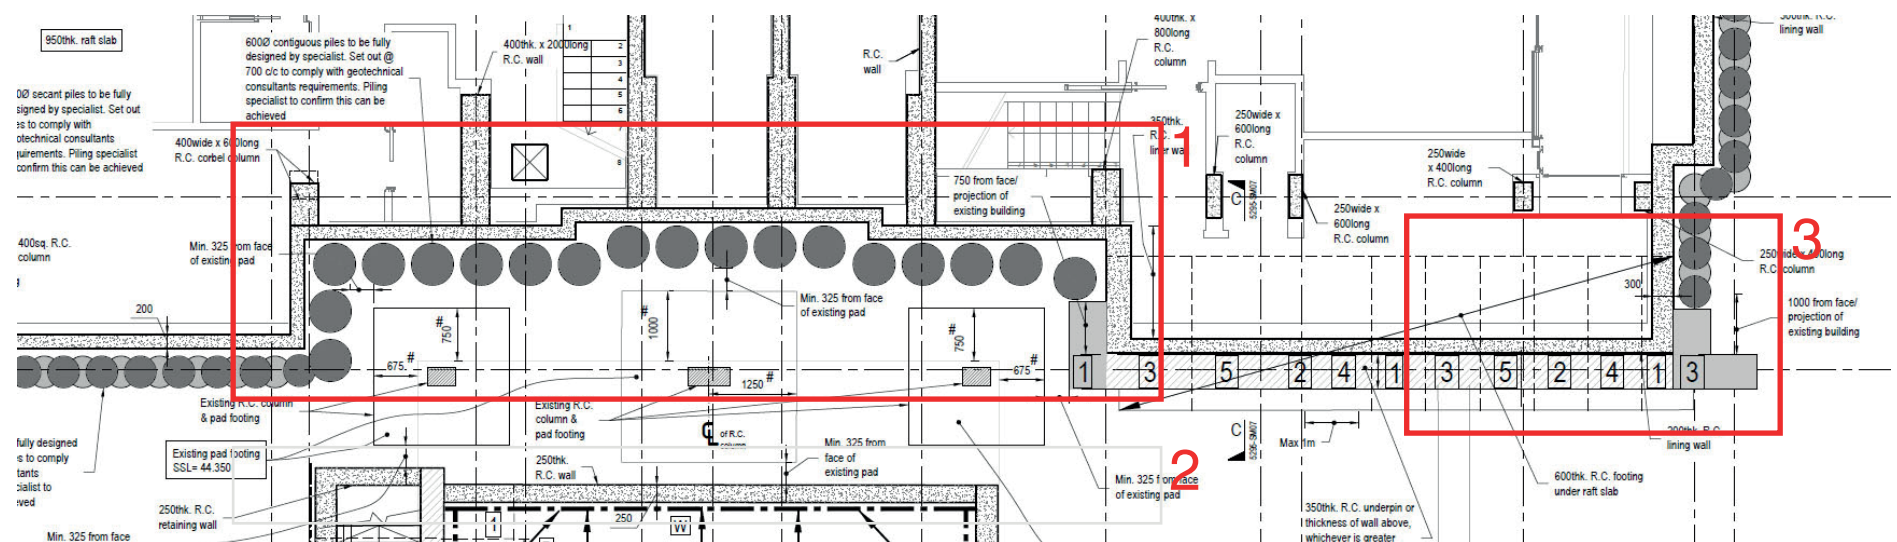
PROPOSED - New configuration showing 600mm piles to the north of the existing pads and linear reinforced concrete wall to the south inside the consented extension to the existing plantroom off Barrie House.
